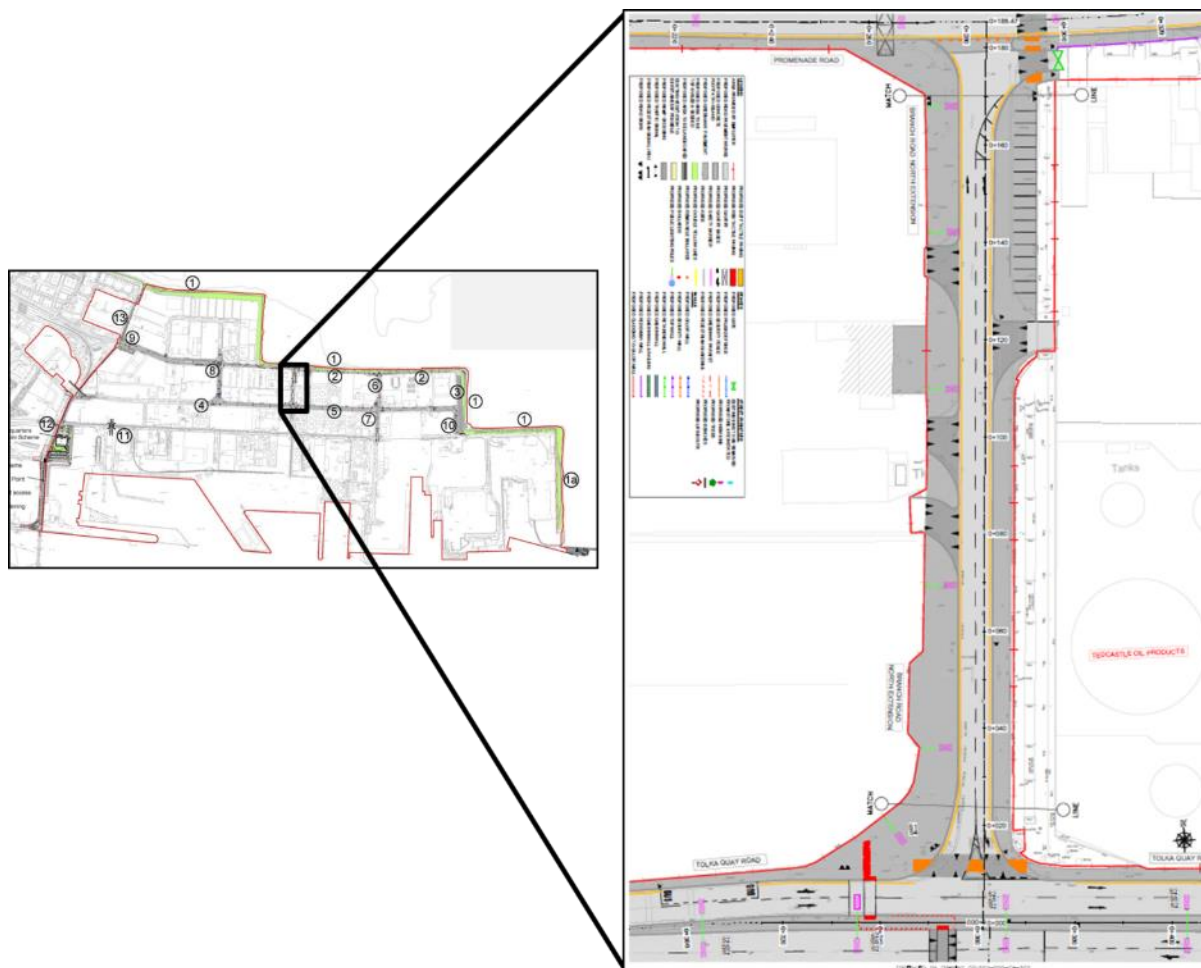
Consented Amendment to No.2 Branch Road North Extension
